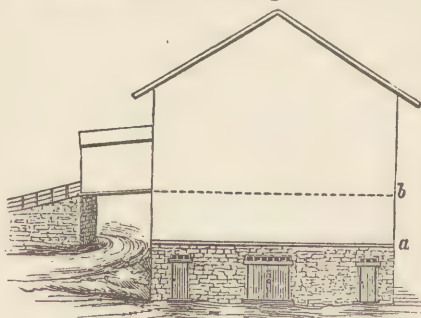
END VIEW OF LARGE THREE-STORY BARN.
